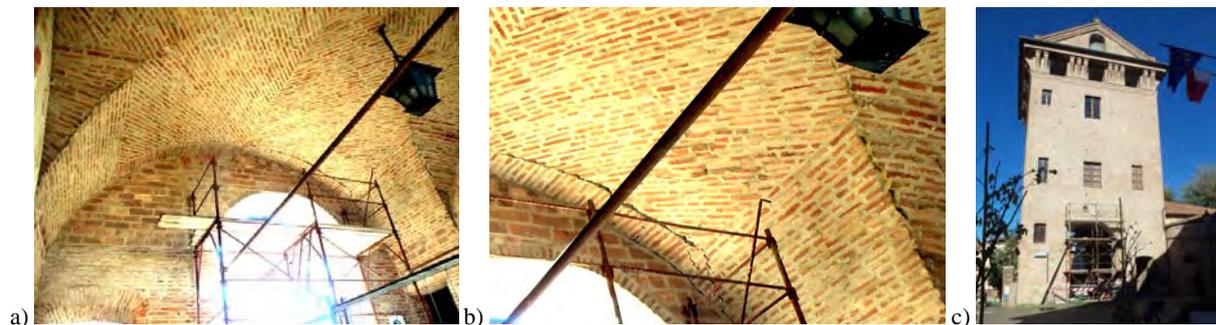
Civic Tower of Gonzaga. Details of the vault damage (a,b). Deformations or movements of the walls, even if limited, can damage arches or separate vaults from the perimeter walls, as happened in the vault at the base of the Civic Tower of Gonzaga apparently not damaged in the outside walls (c).
